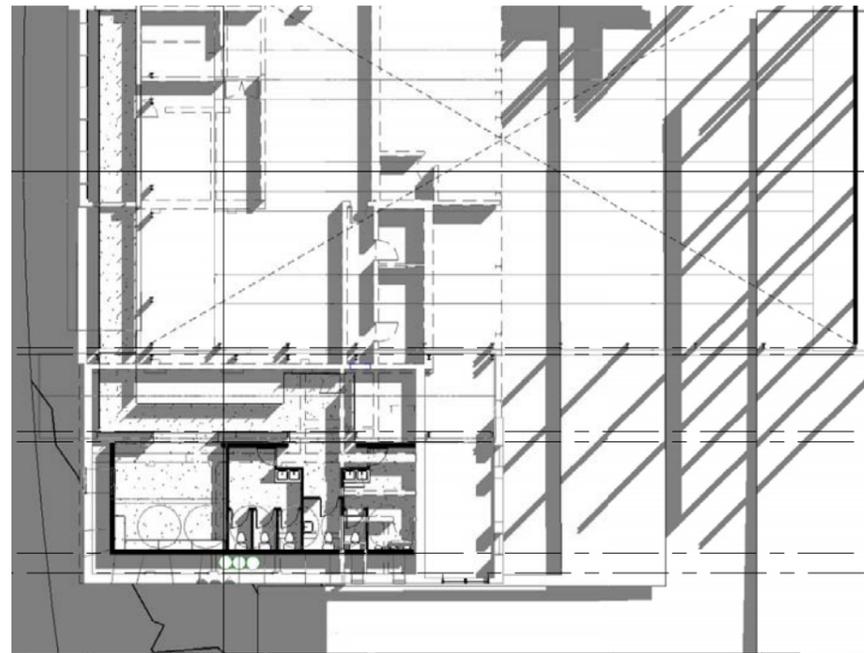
Part of street level plan with too many shadows (Author June 2013)
